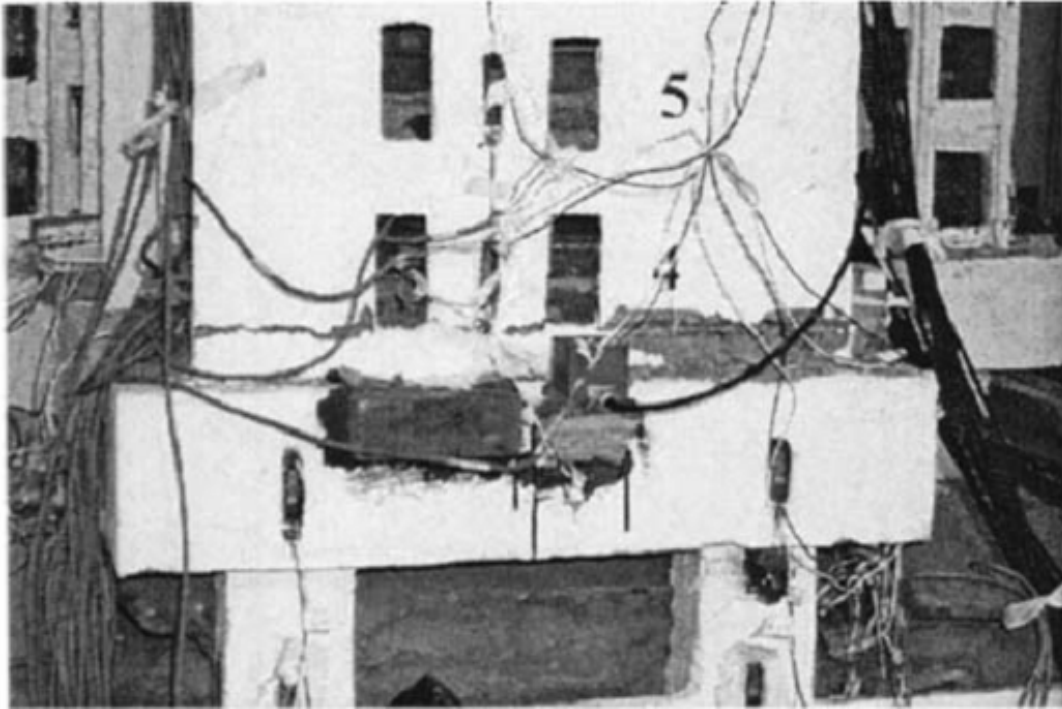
Structural failure on exterior walls at transfer level (Li *et al.*, 2006)
